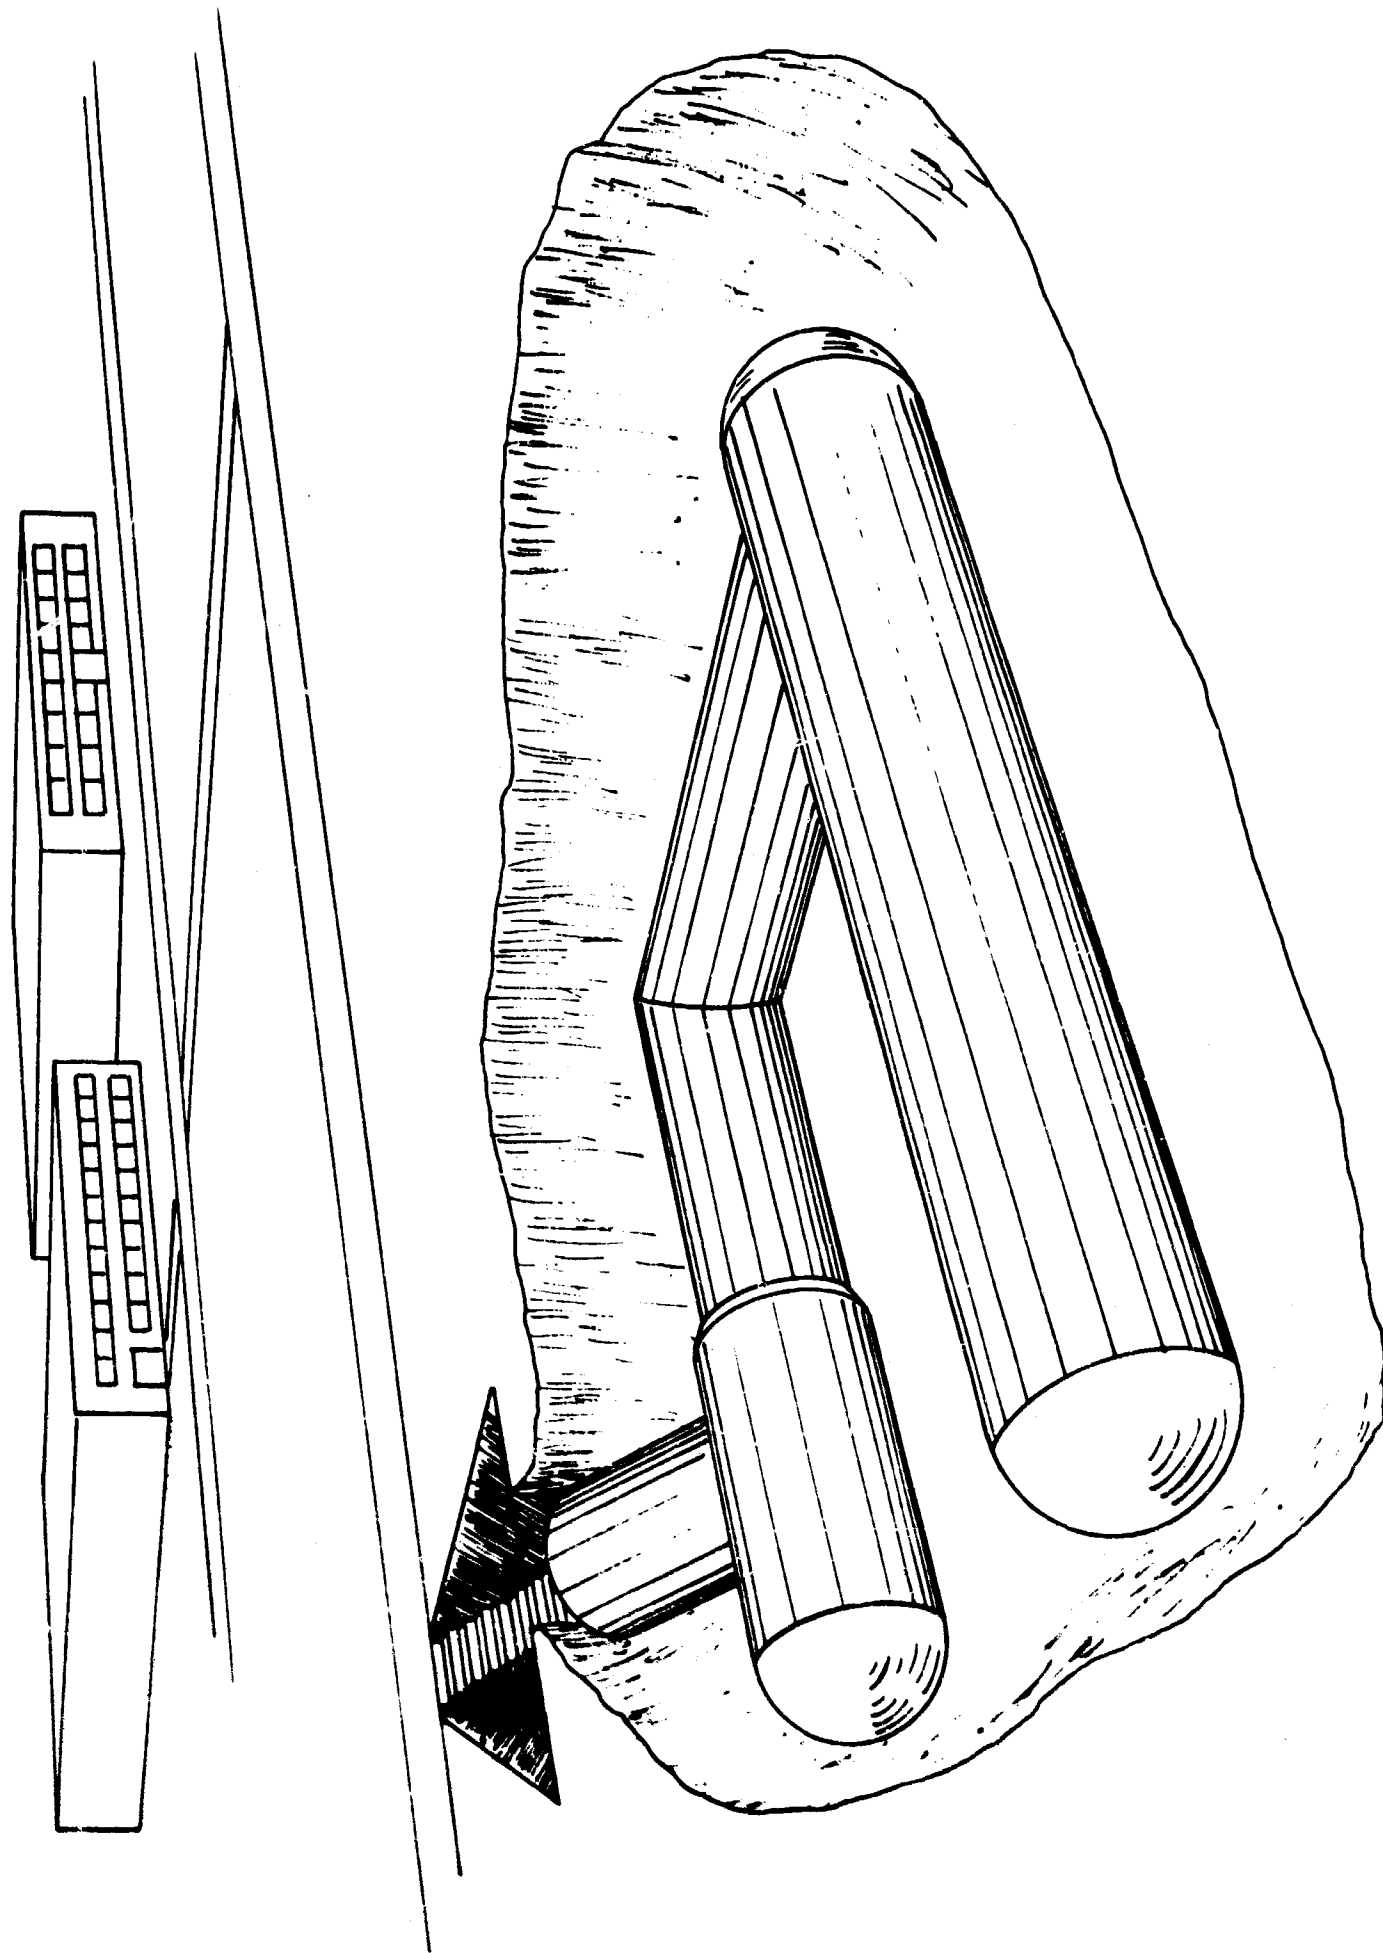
ENTRANCEWAY CONFIGURATION WITH COMPRESSION CYLINDER BLAST SECTION
